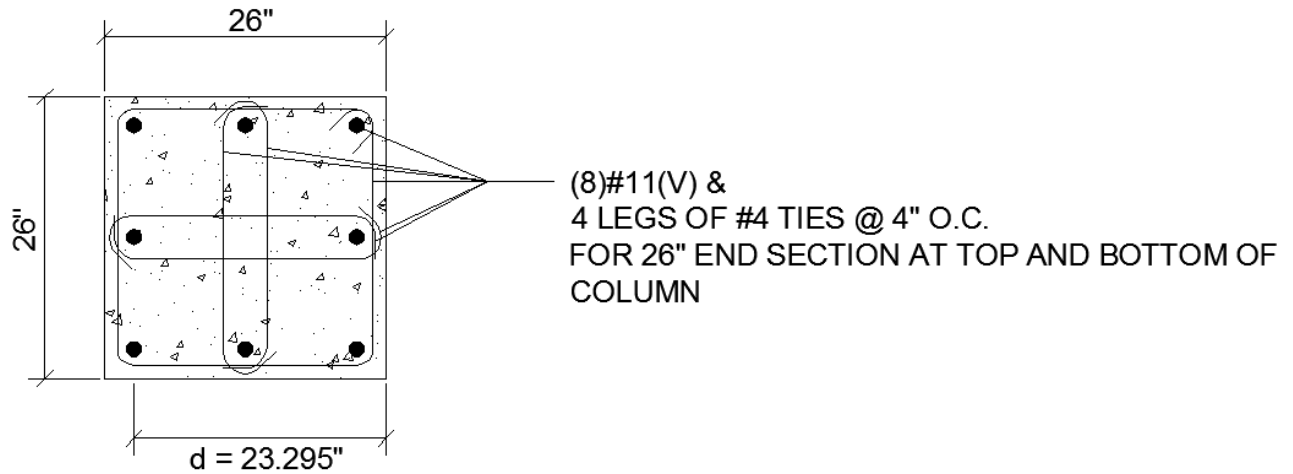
Exterior column, cross-section at end of column at ground floor level based on tsunami design requirements.
